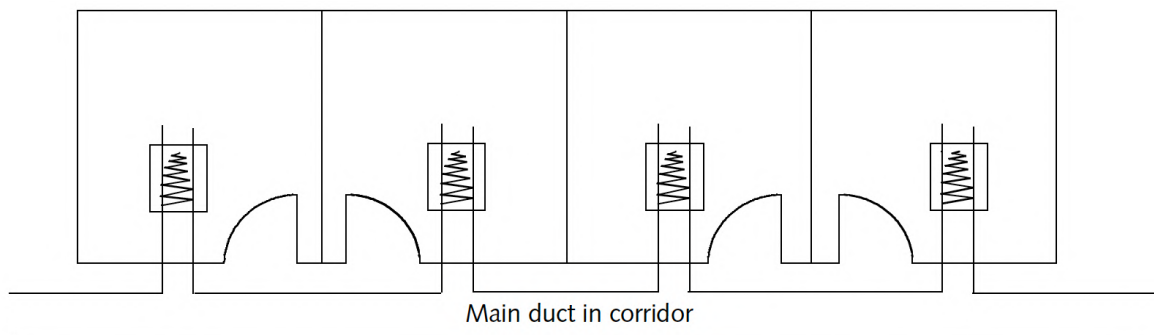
TYPICAL ROOM LAYOUT WITH ROOMS BOTH SIDES OF CORRIDOR DUCT
